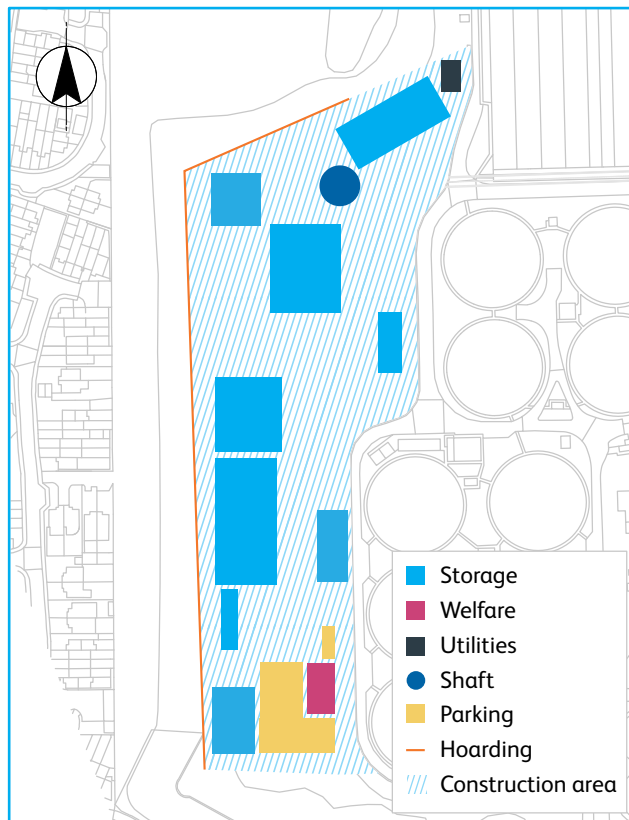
Indicative proposed Mogden STW construction site layout (Western Work Area)
